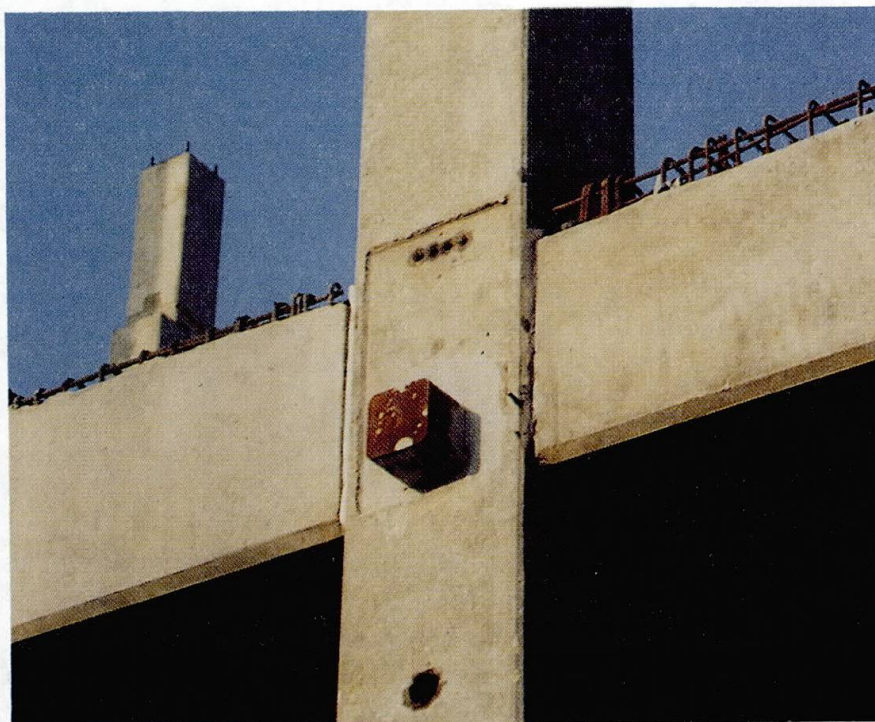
Three-way precast concrete billet type connector. Note the projecting interface stirrups in the beams and the sleeves in the column to receive continuity tie steel.
